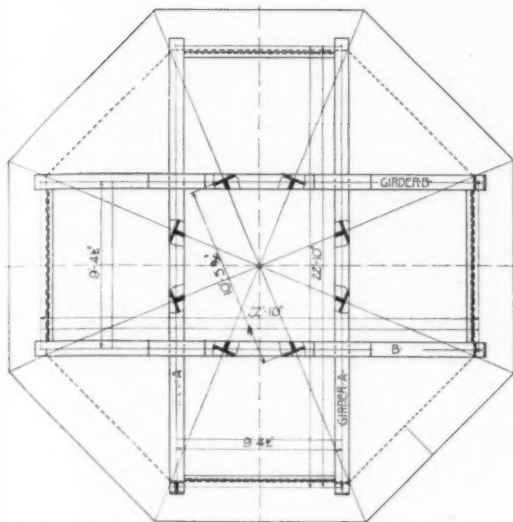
Plan of top of lantern, showing location of lantern columns, girders A and B and base of posts in the fleche.
